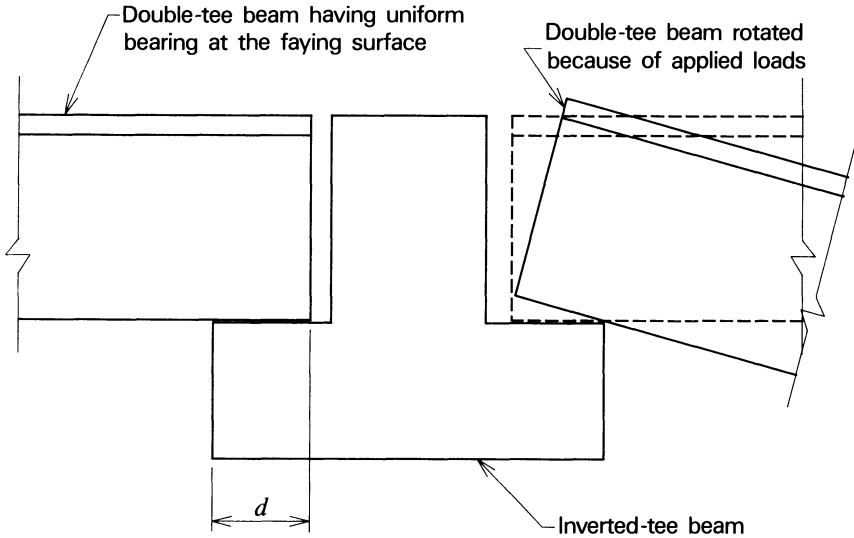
Connection of double-tee beams and inverted-tee beam.
